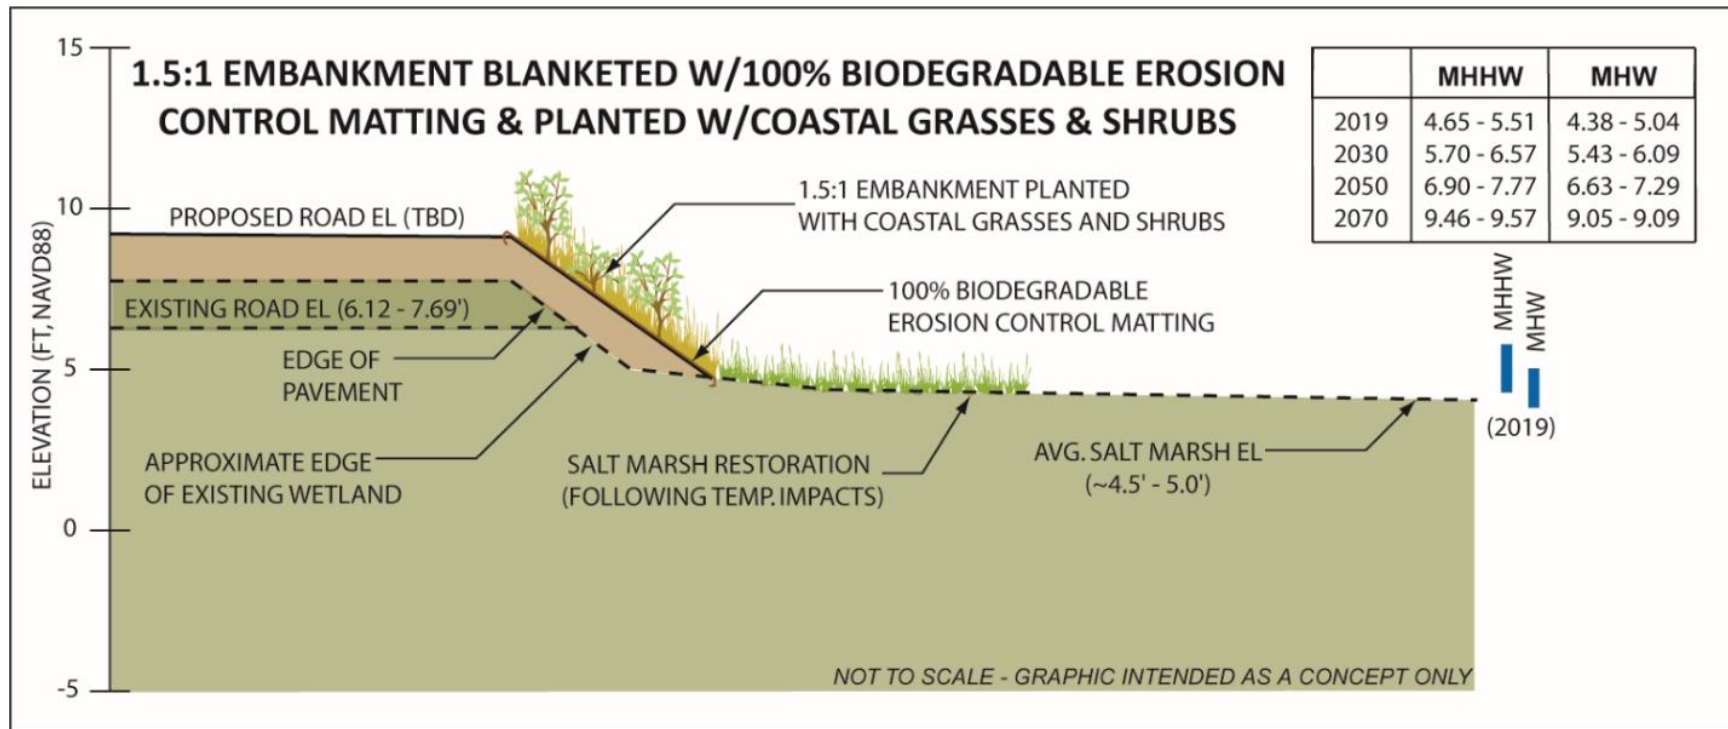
Raised roadway and reconstructed embankment alternative at 1.5:1 slope.
